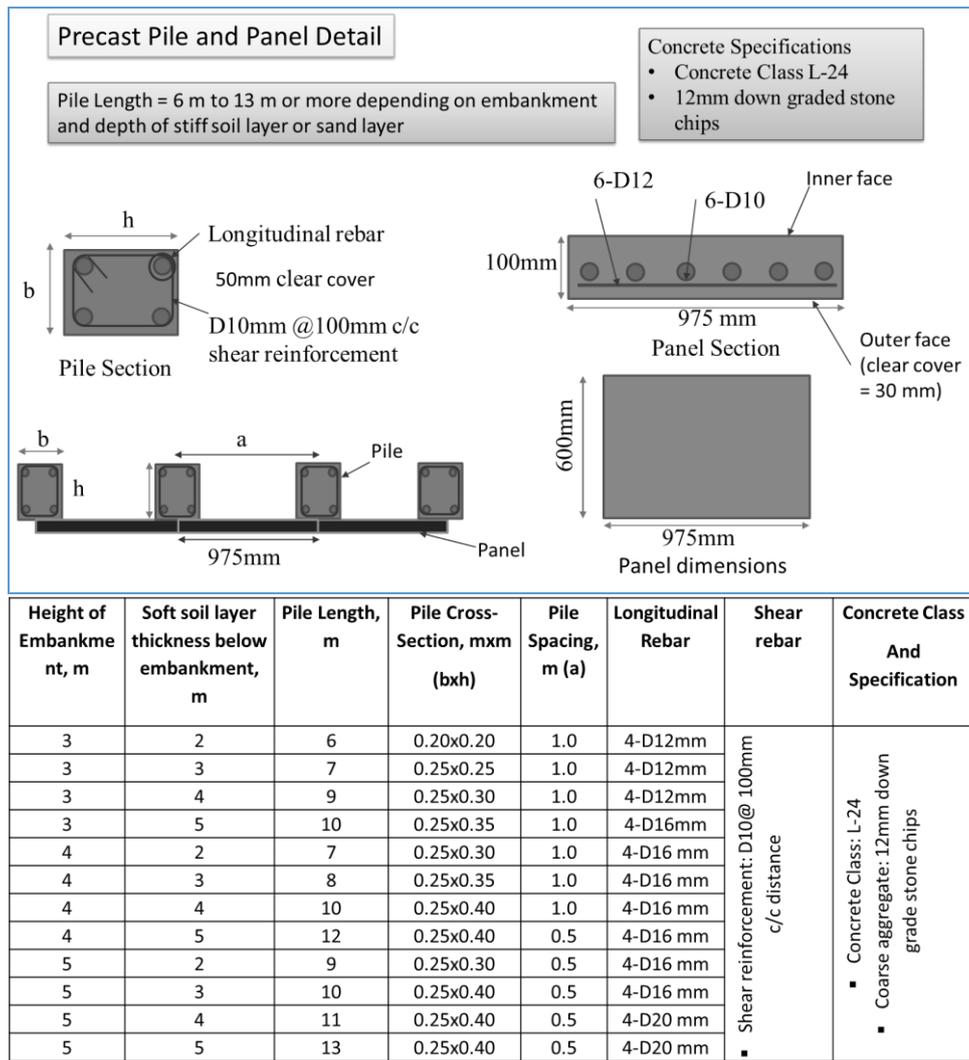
Details of precast pile and panel for one/both side pond or khal situation
